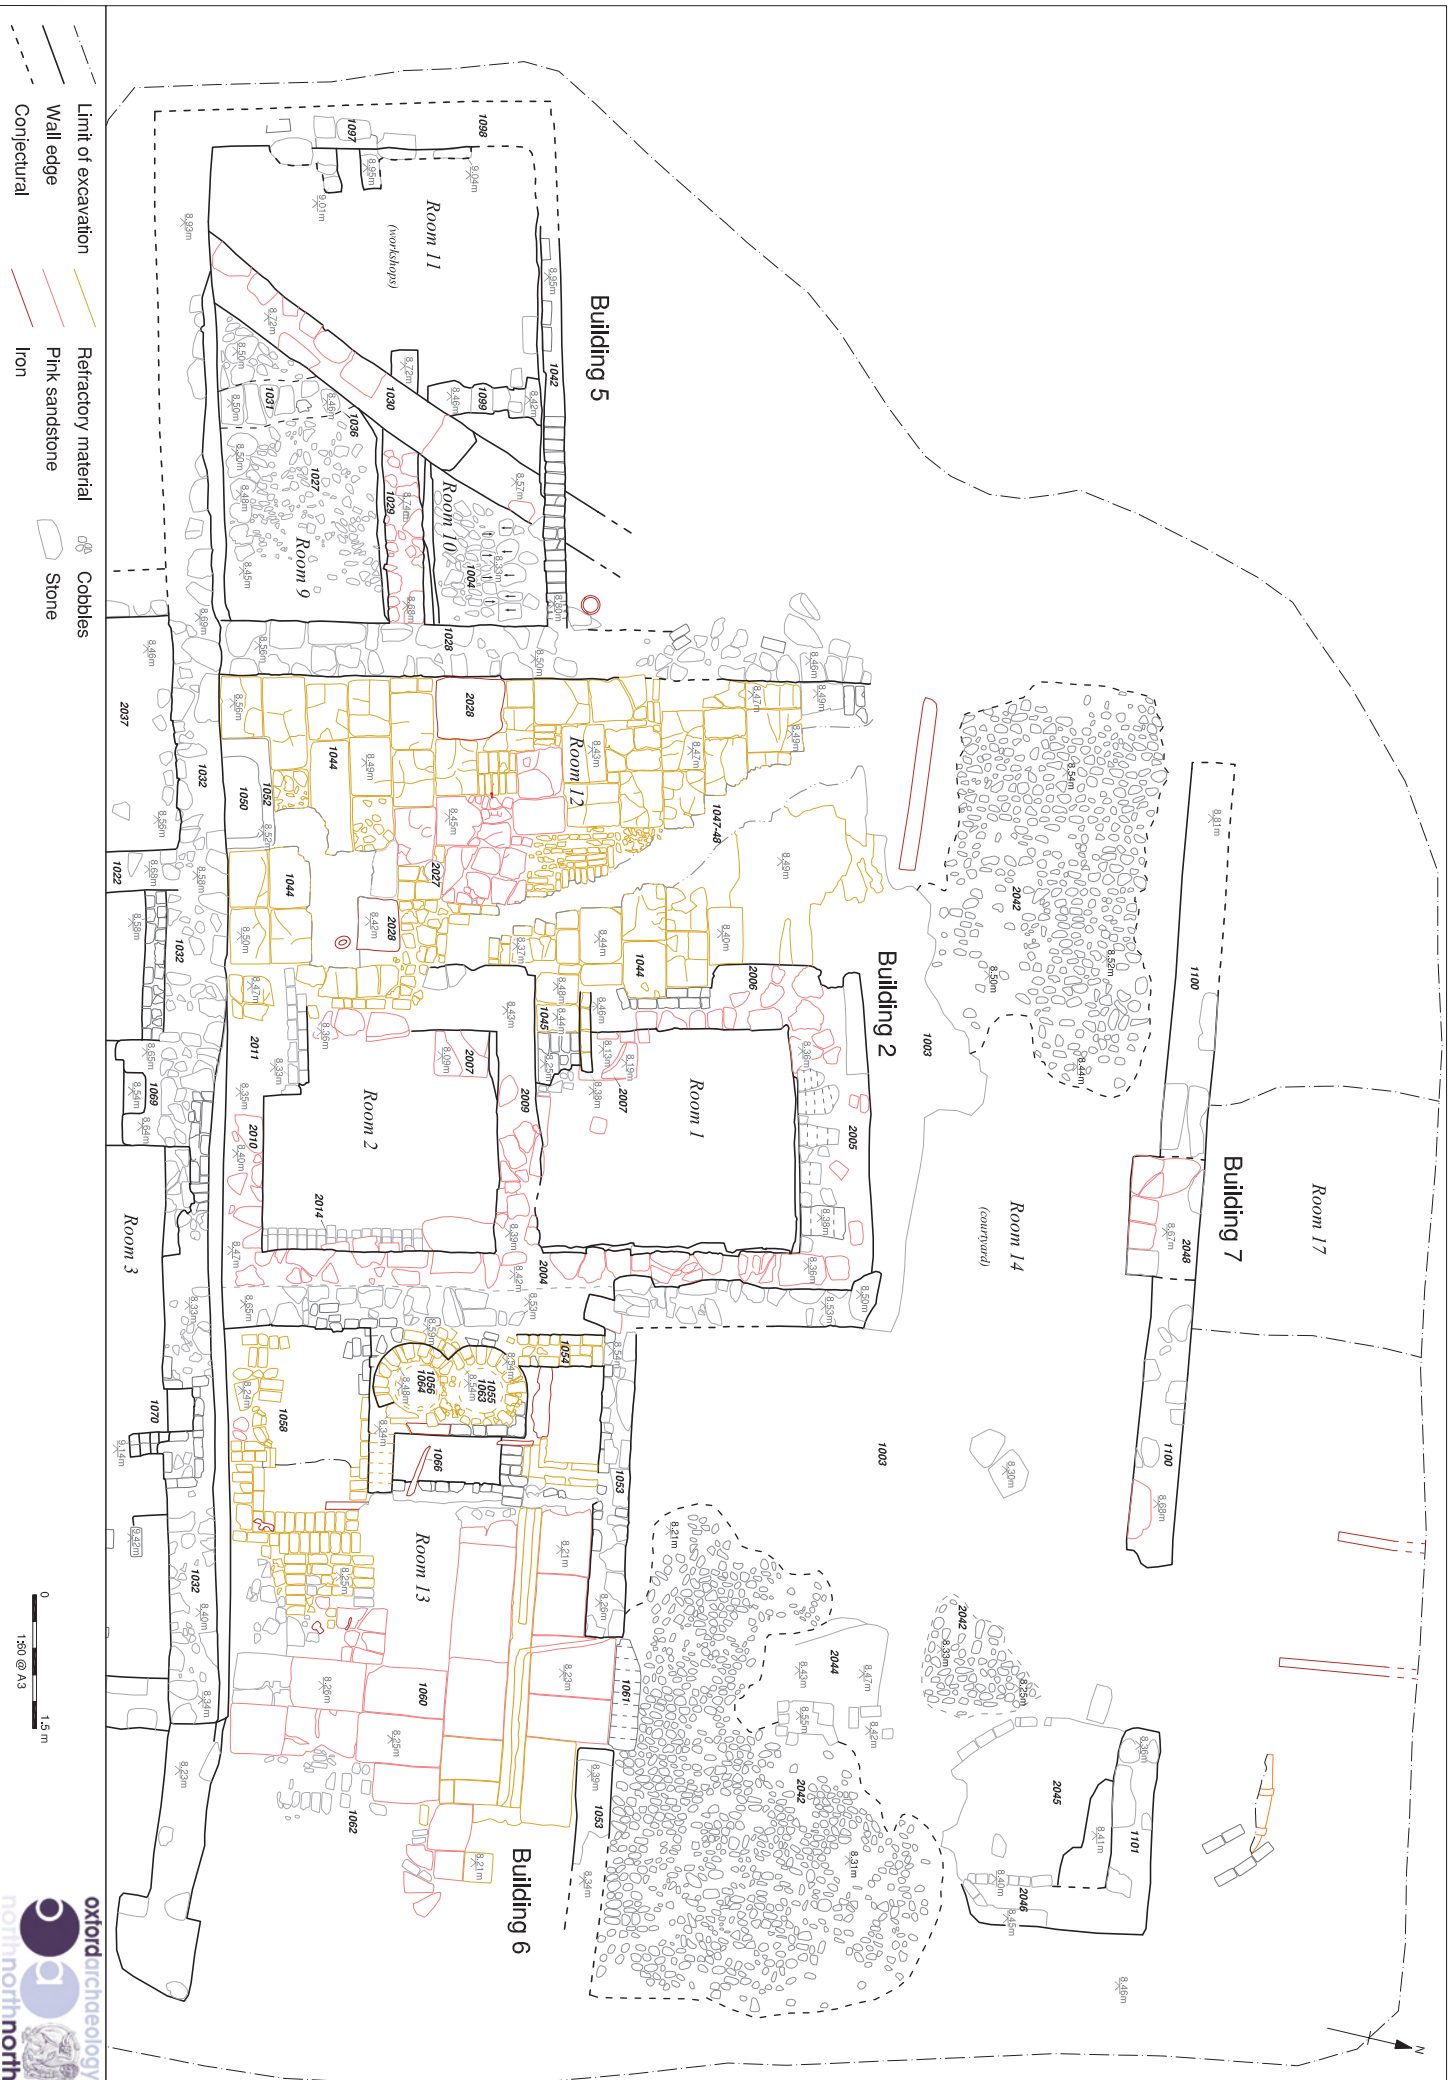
Albion Square excavation plan, north area showing foundry and furnaces
